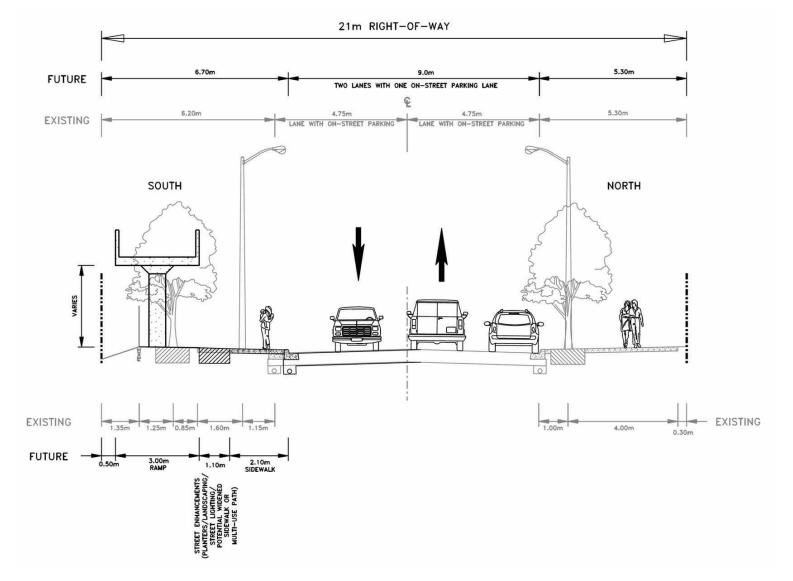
Proposed Douro Street Typical Cross-section (West of Shaw Street)
